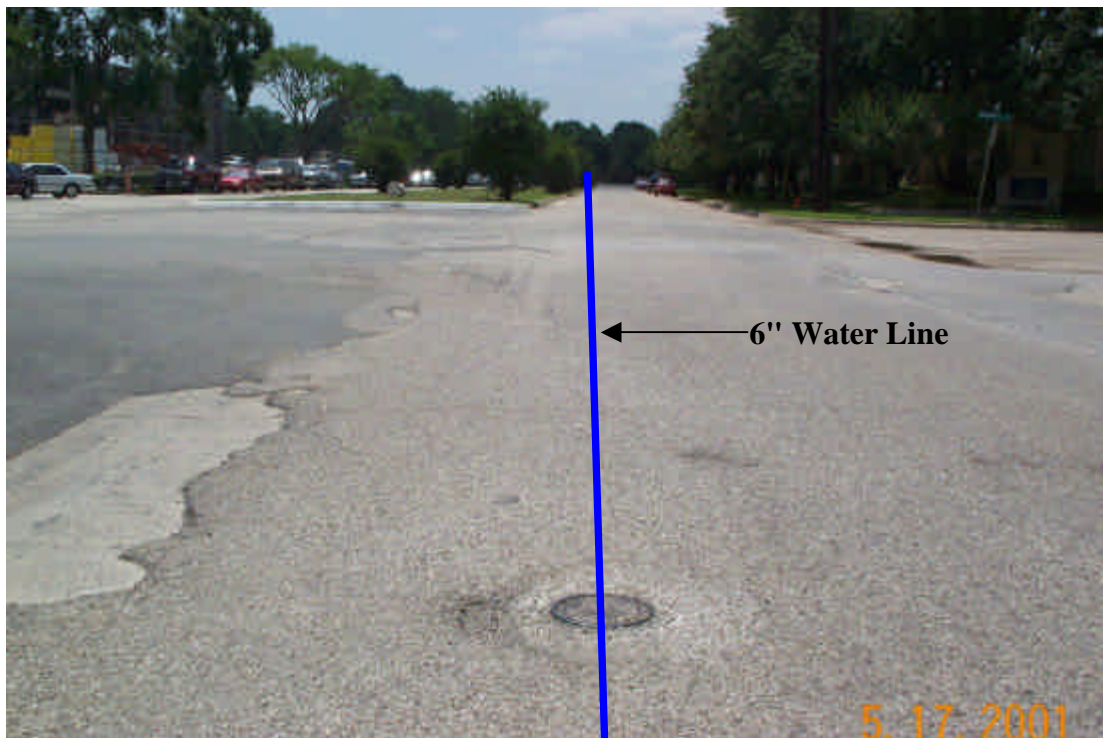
Looking south at valve near intersection of Bandera Avenue and Edgemere Road down Edgemere Road.
